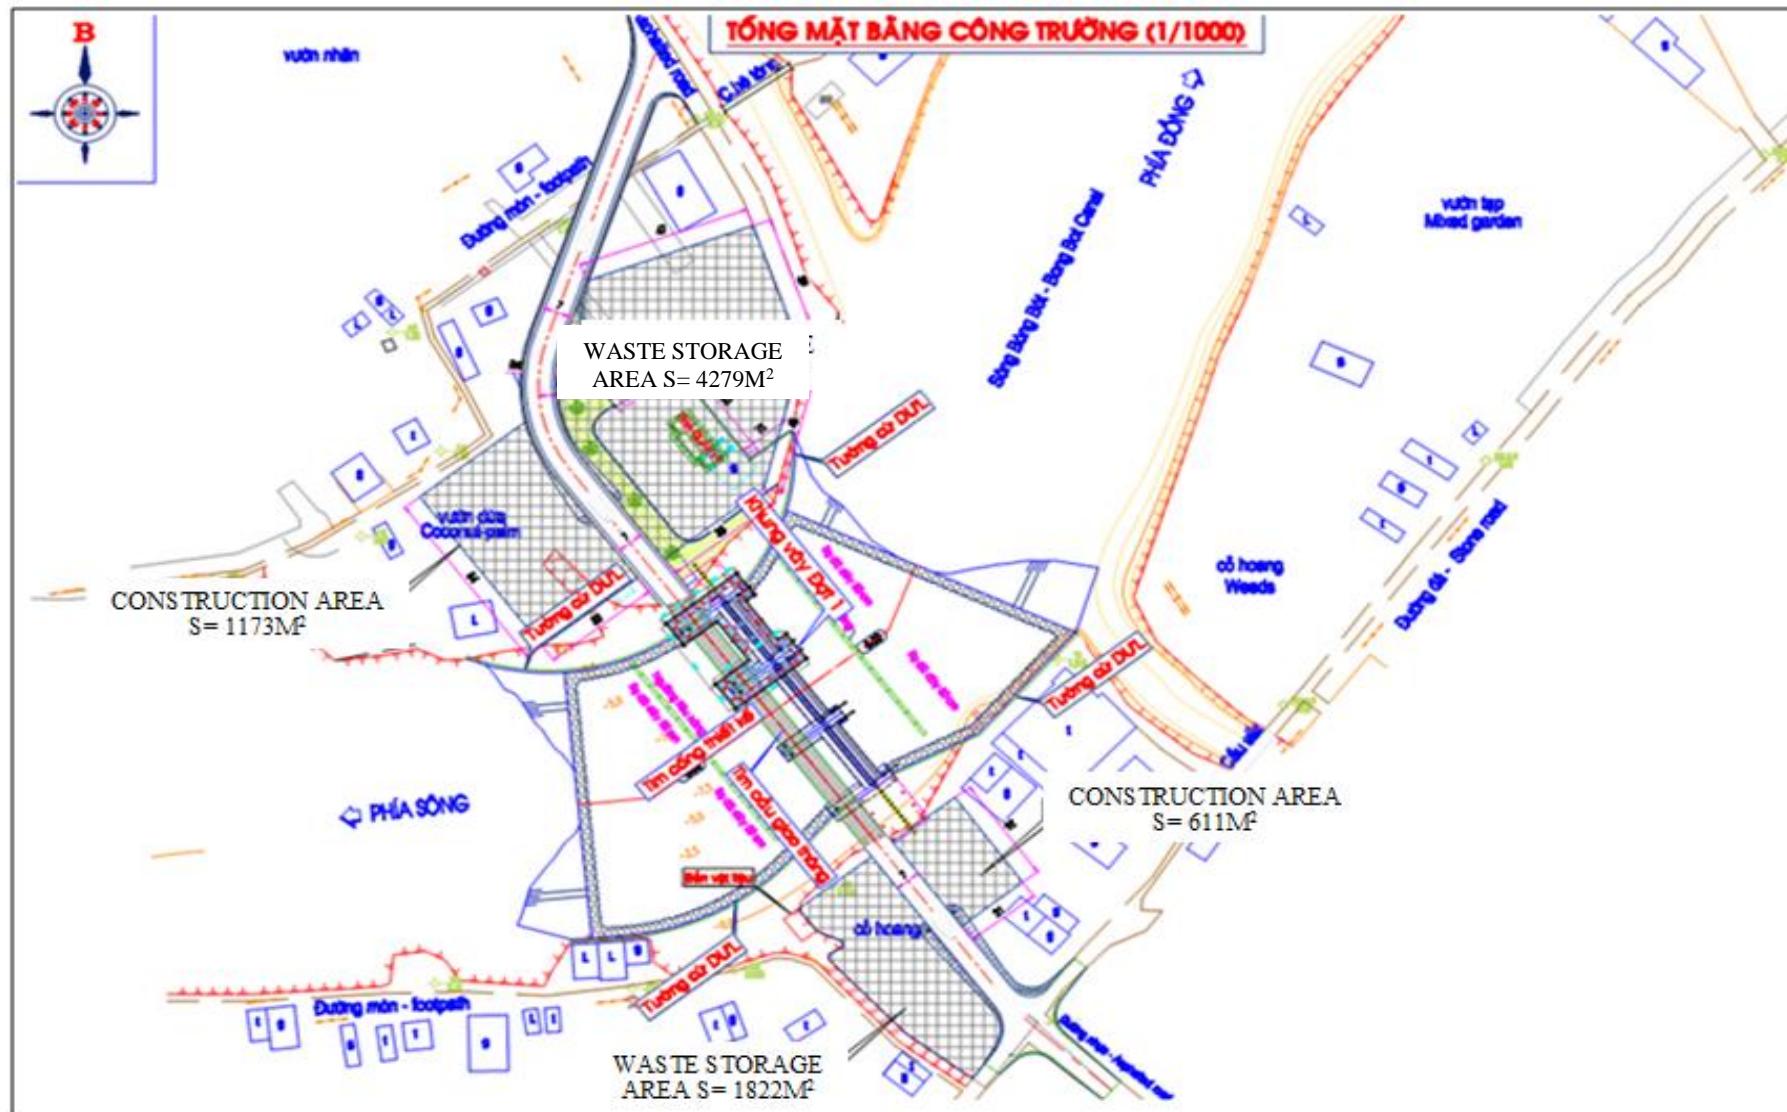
Locations for waste soil storage and disposal during construction of Bong Bot sluice gate
